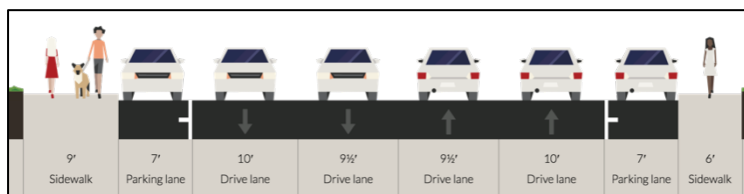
Petaluma Boulevard South at E Street, facing south (52' + sidewalks)
